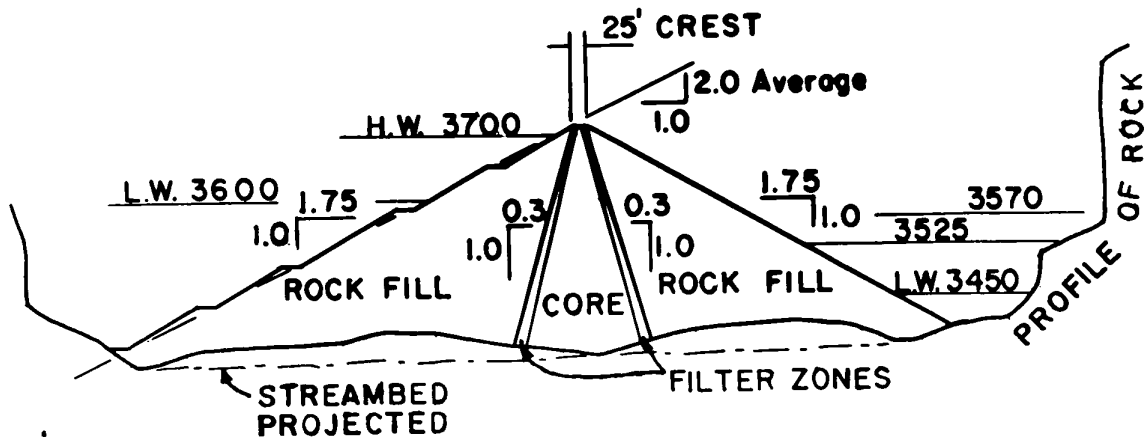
SECTION THROUGH PROPOSED SITE C DAM
